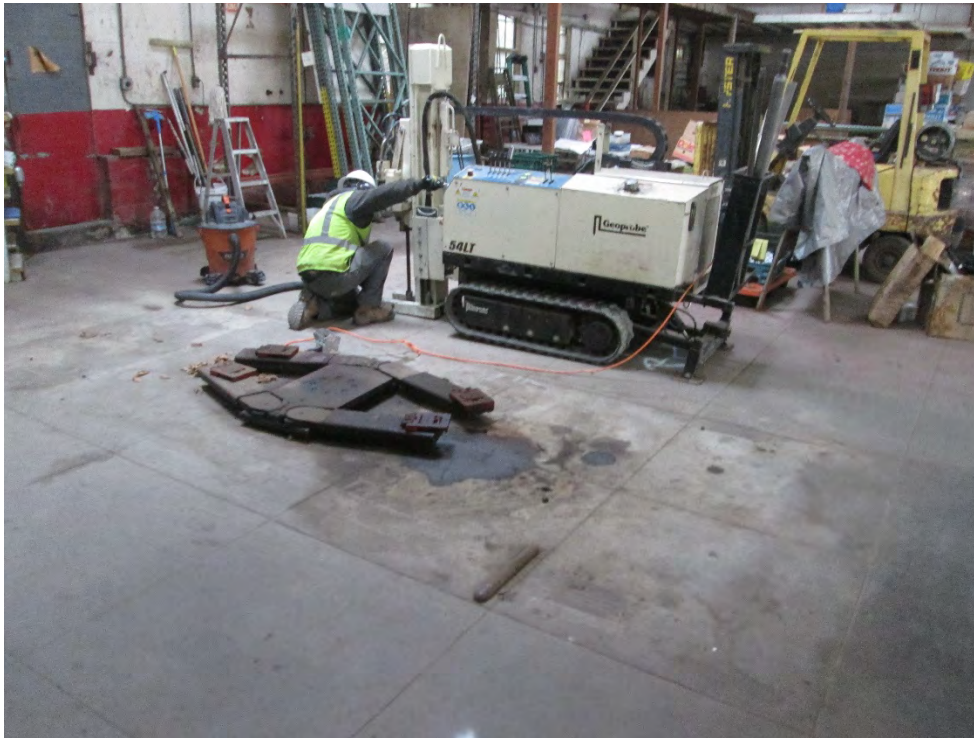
ECA drilling at Boring 1 nearby the inground hoist
